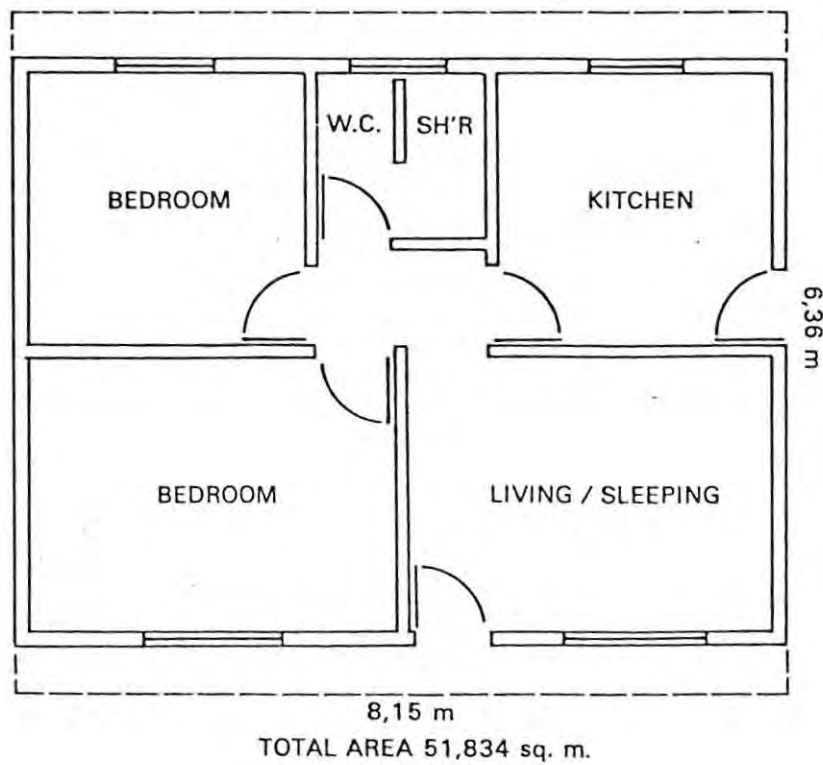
(b): Floor Plan: Newer Housing Type 51/9
